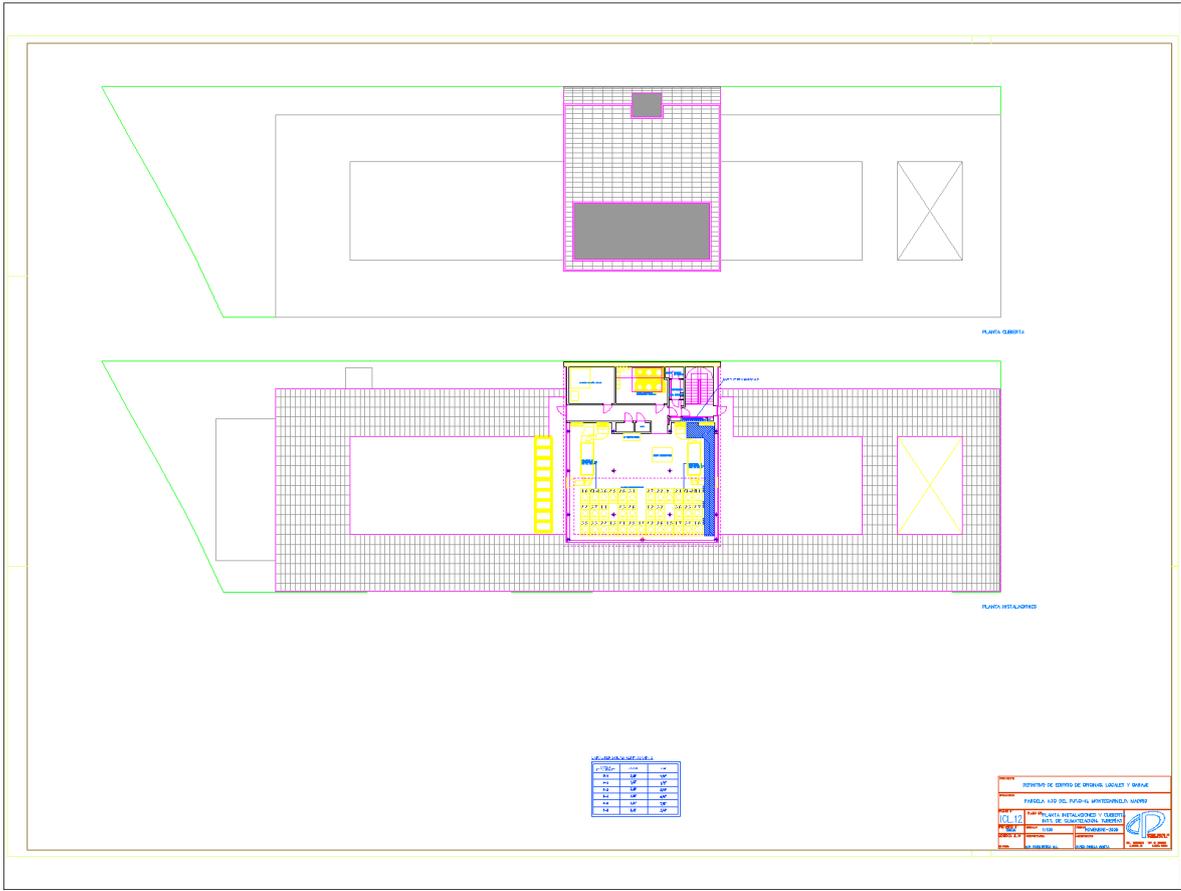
Roof plan of the Monteolmo Building. Source: AutoCAD
